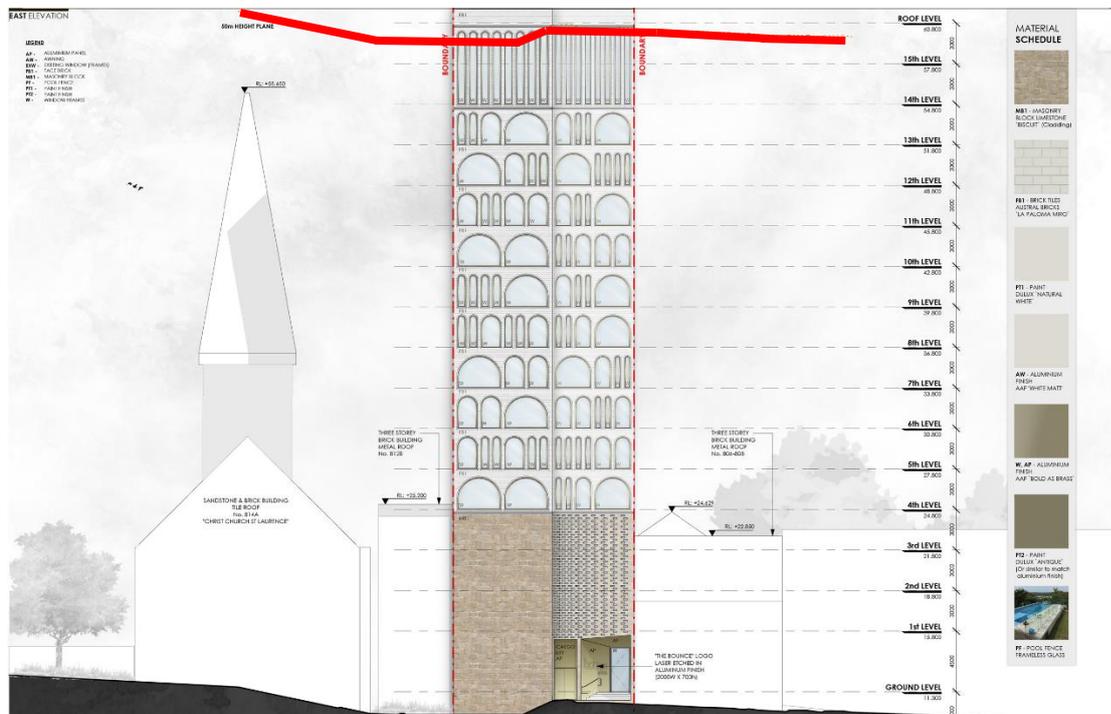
The rear elevation on St Laurence Lane, with the maximum 50 metre height of building development standard in red
